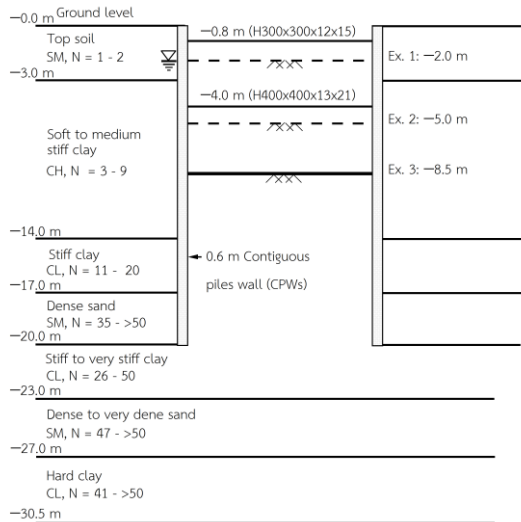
Cross-section profile of excavation and subsoil condition of the project.
